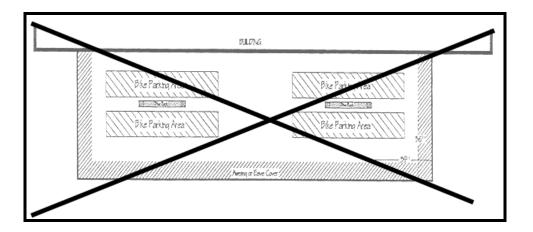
I.10.b Covered Bike Parking Layout
